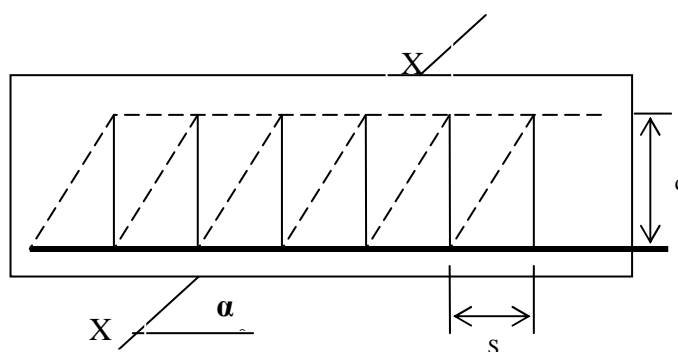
Members of a pin jointed truss with concrete (---) compression and steel (___) tension.
